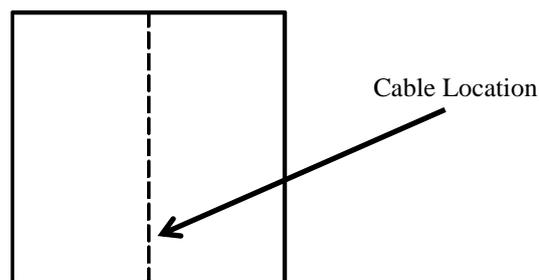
Handkerchief Surface TFS model with one reinforcing cable
